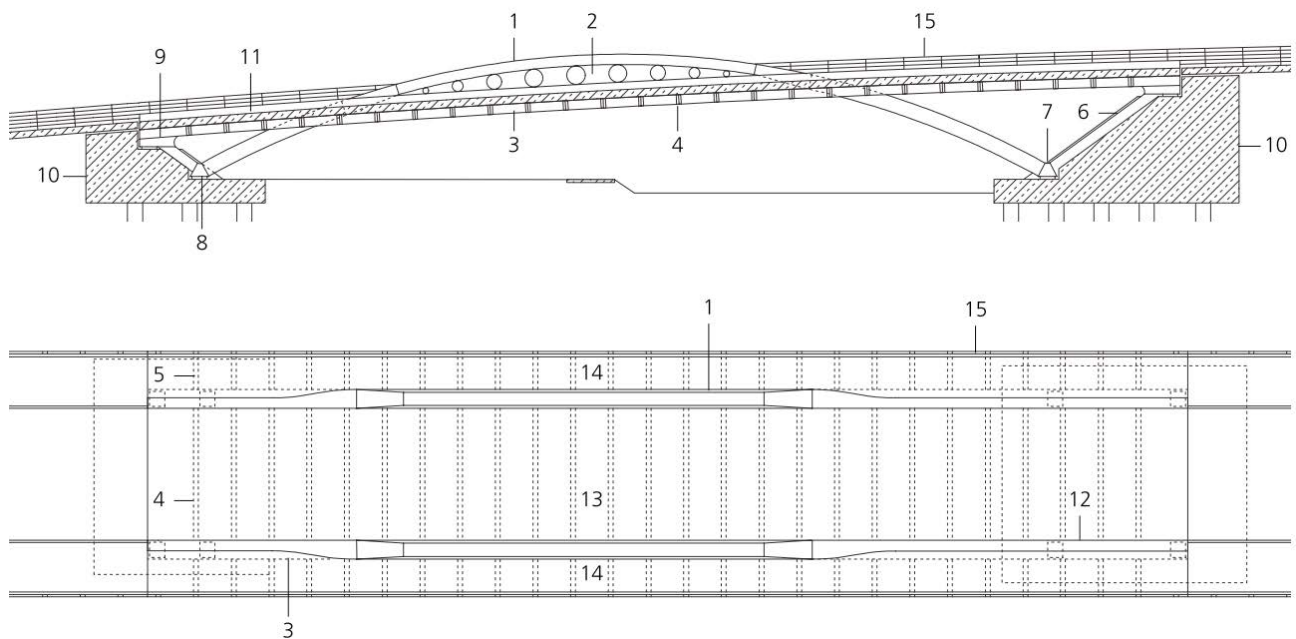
Structure of Cala Galdana Bridge on Menorca (Spain)
